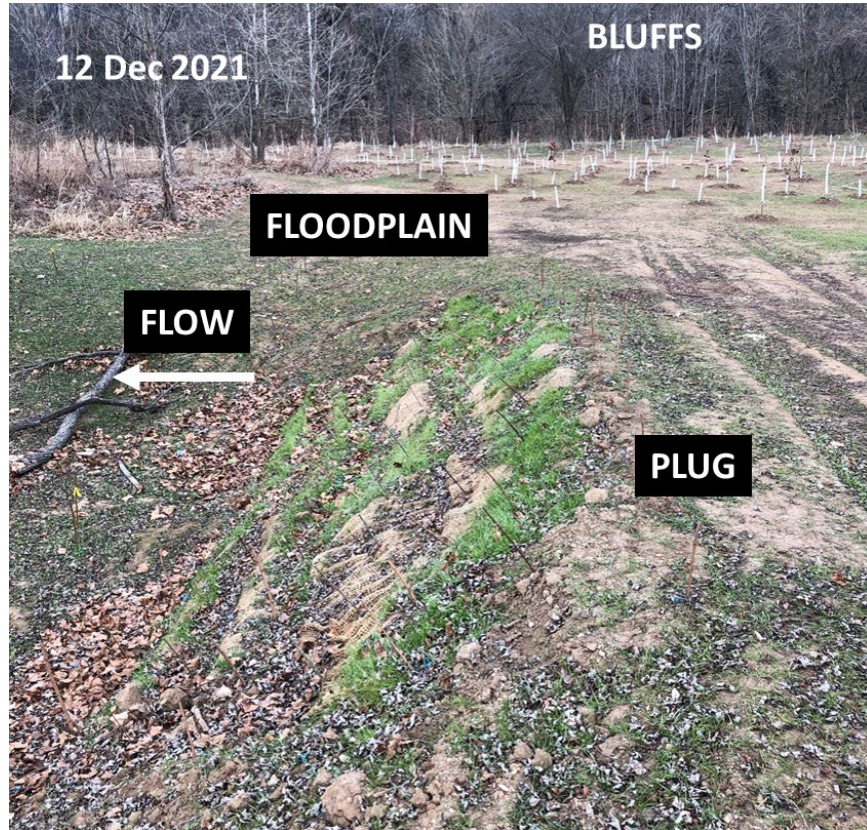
Floodplain and plug, facing RDB bluff; immediately downstream of bank 1, on floodplain.
